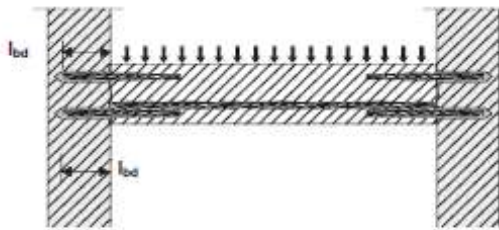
End anchoring of slabs or beams, designed as simply supported
